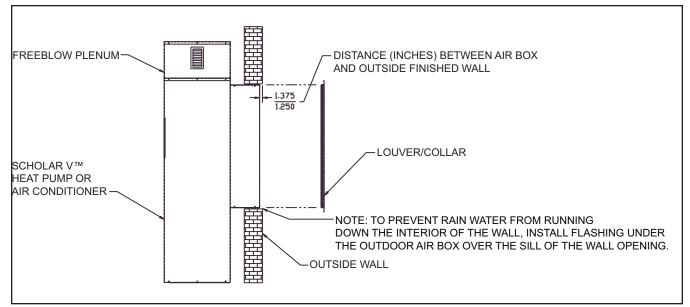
Dimension between Scholar 2.0 Air Box and Finished Outside Wall for Outdoor Louver/Collar Assembly Installation.
